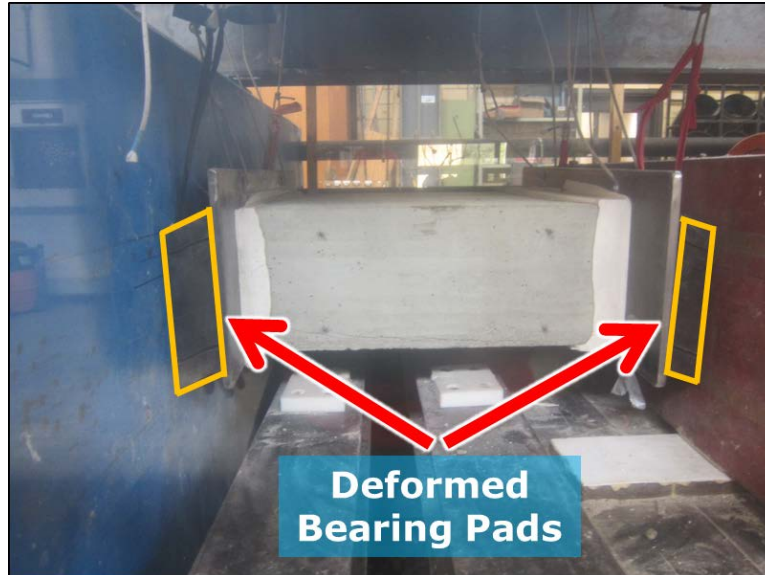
Bearing Pad Failure During 9-in. Control Tests
